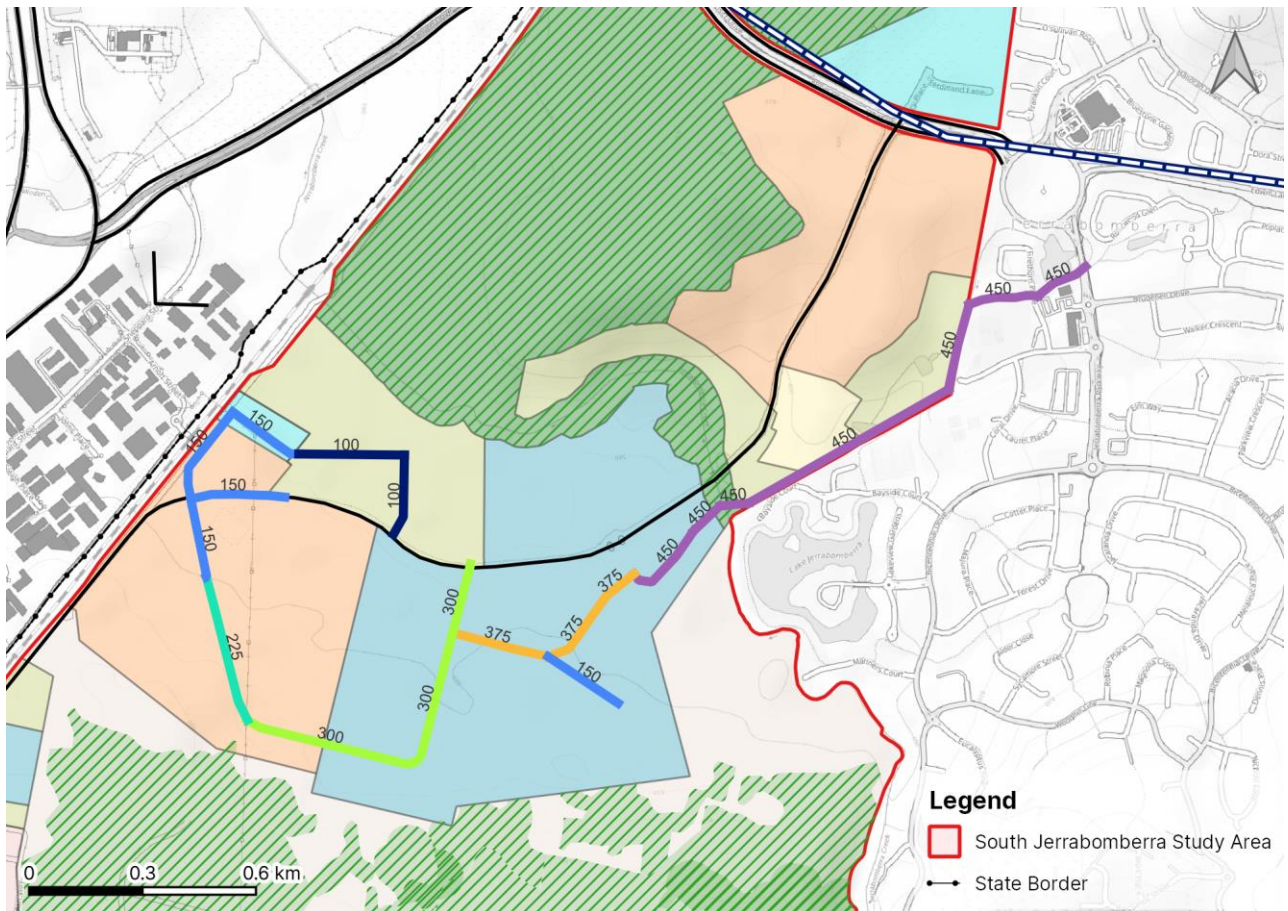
| Proposed Trunk Water Reticulation (trunk diameters shown numerically in mm on plan)
